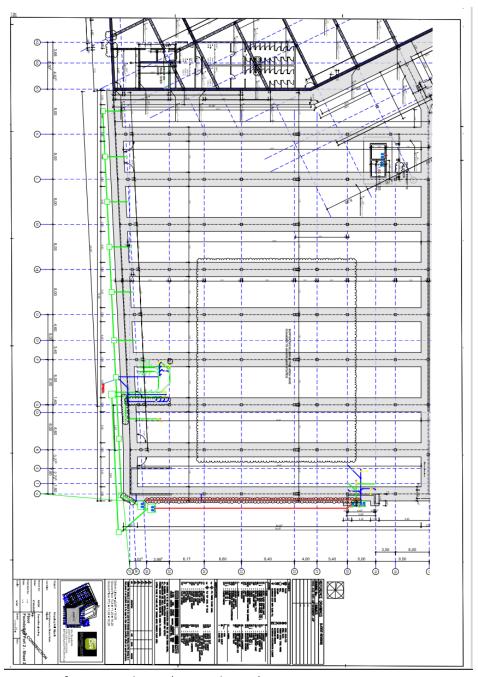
AIP Foundation (Part 2 Sheet 3)
